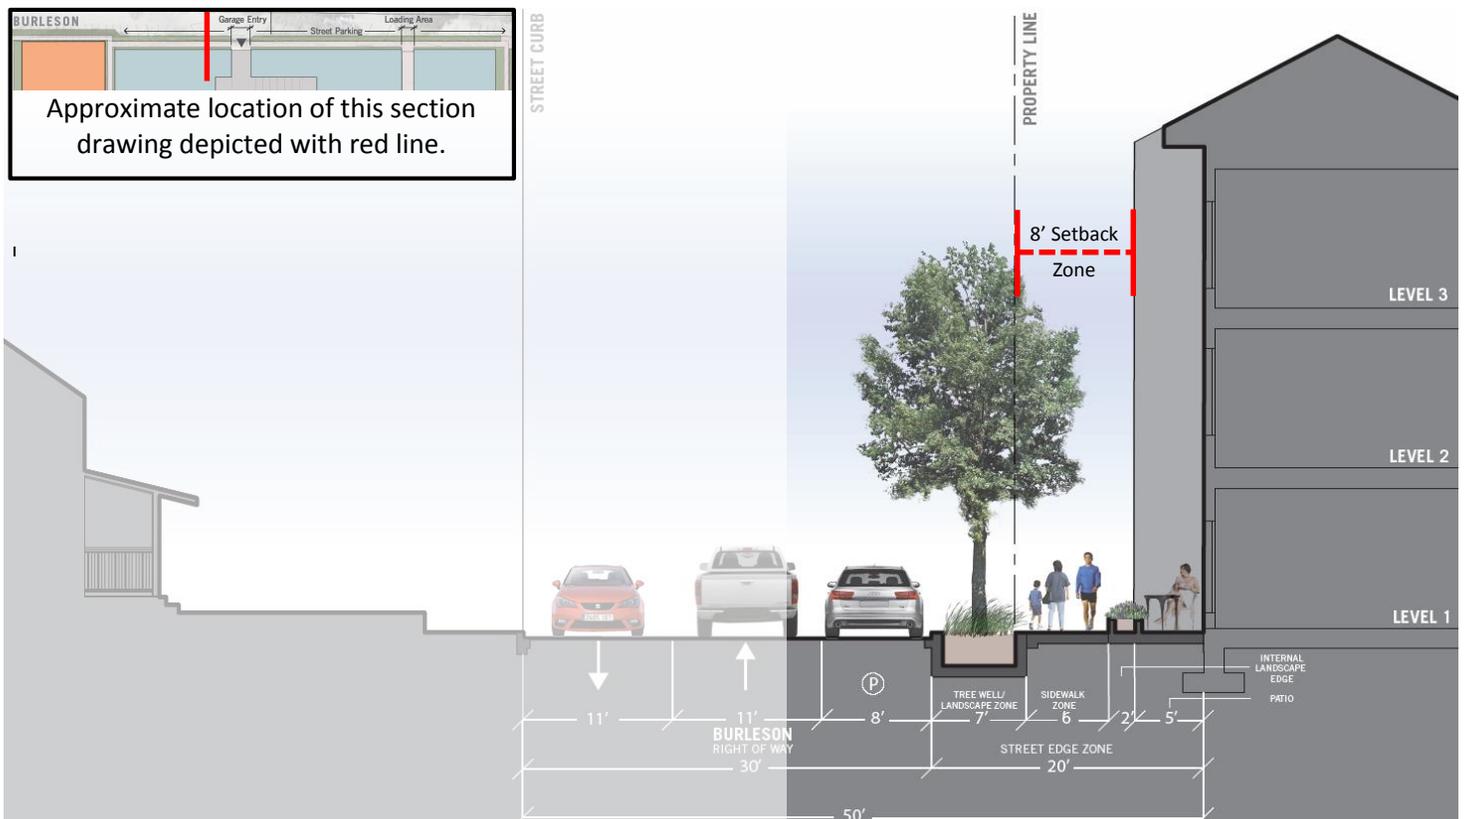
Burleson Street streetscape design concept adjacent to multifamily building, where building expression is farther from the right-of-way.
